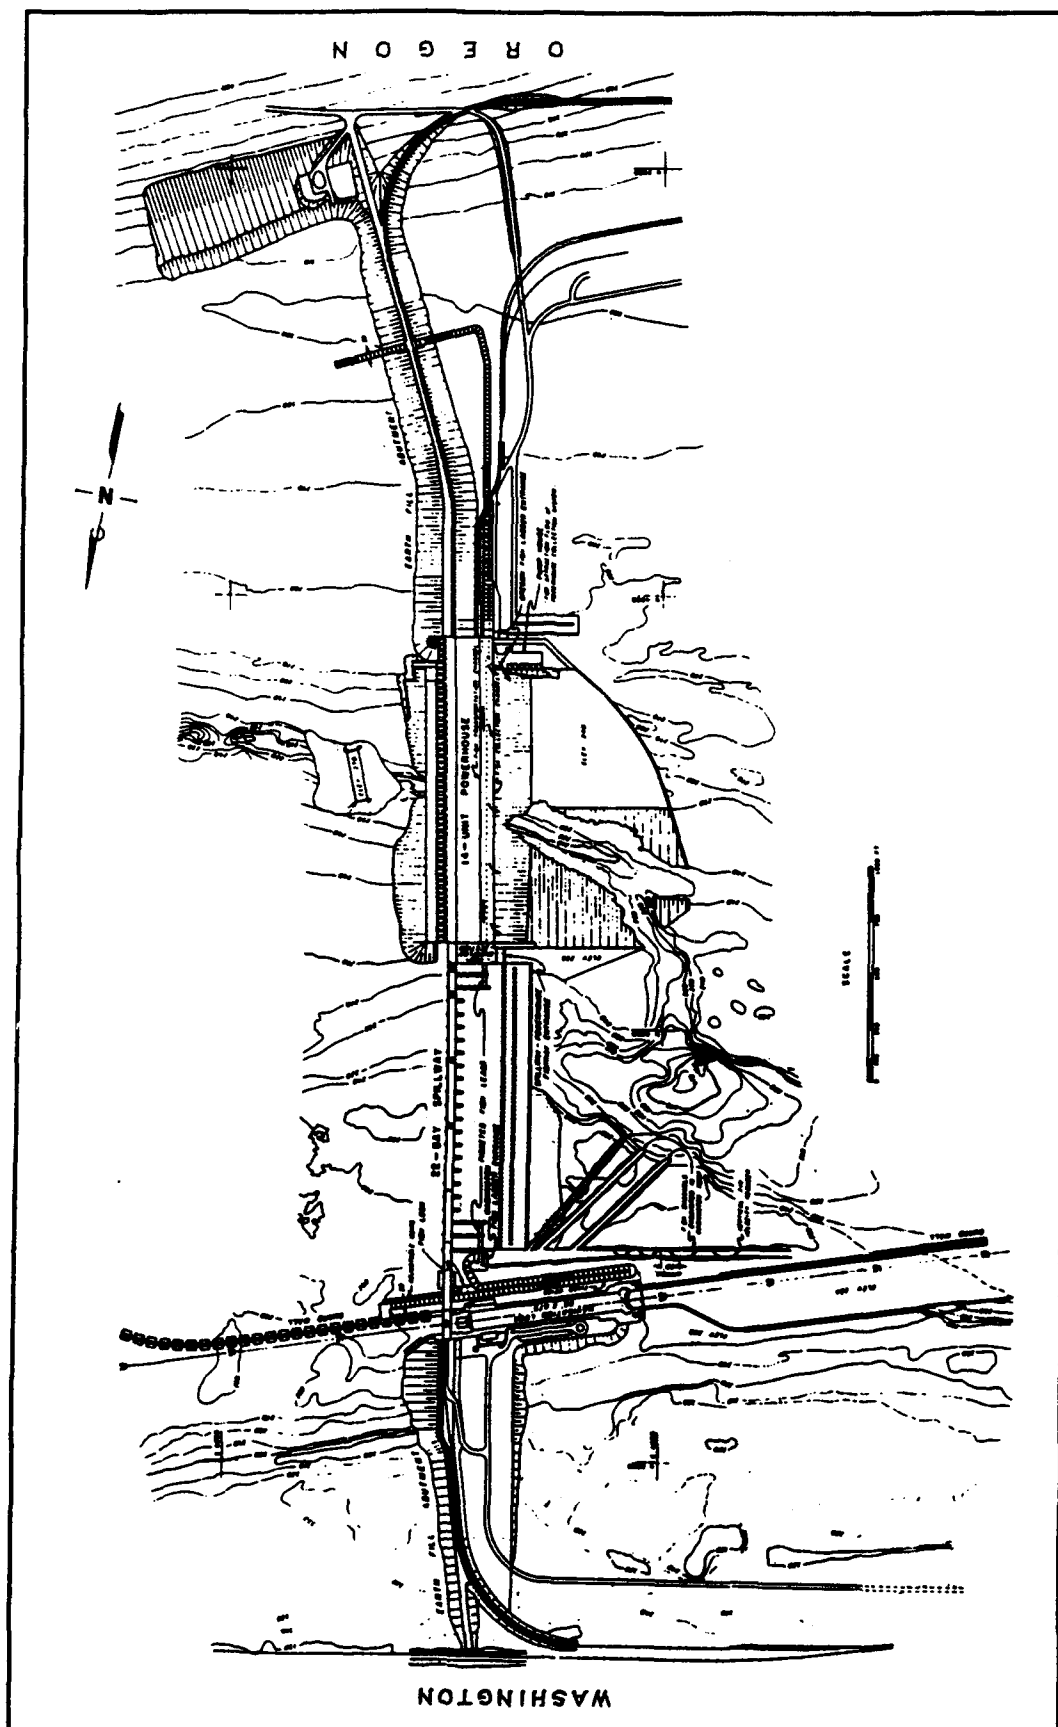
Plan view of McNary Dam showing approach channel configuration and location of powerhouse and spillway
